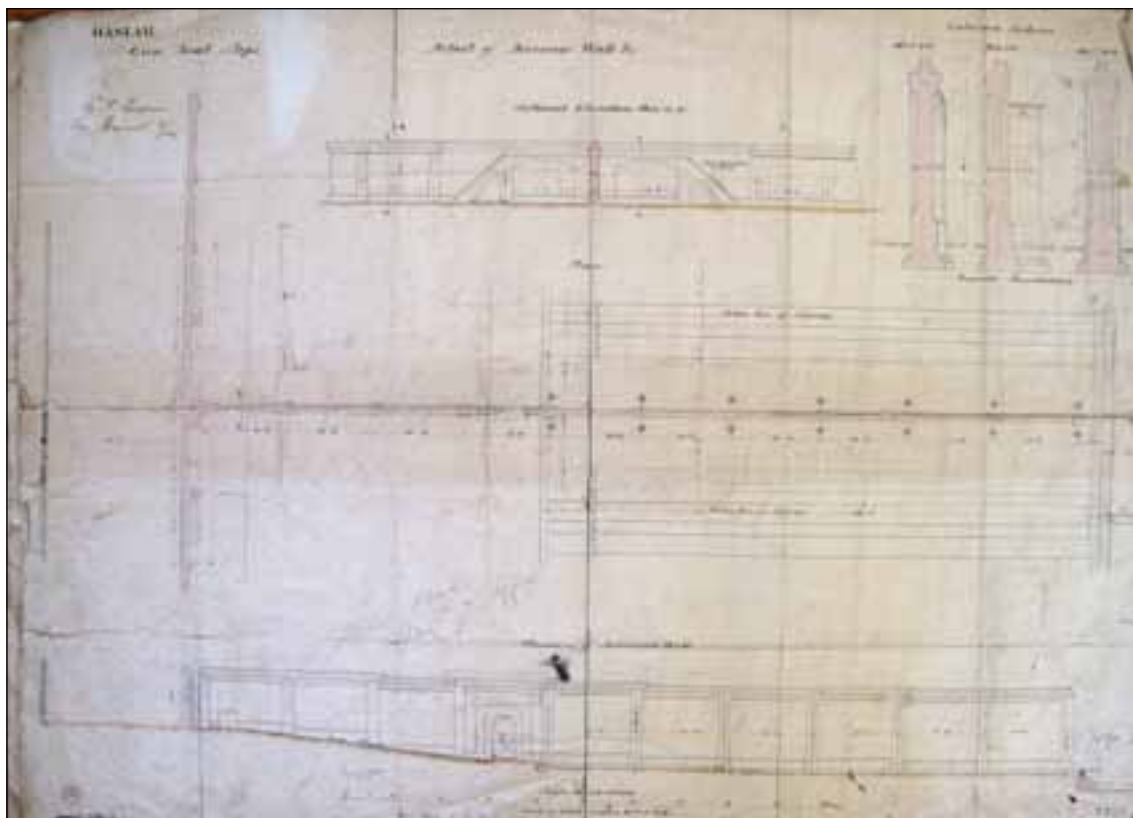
Late 19th century plan for a dividing wall with sentry walk between the slips (EHA MD 95/6513)
